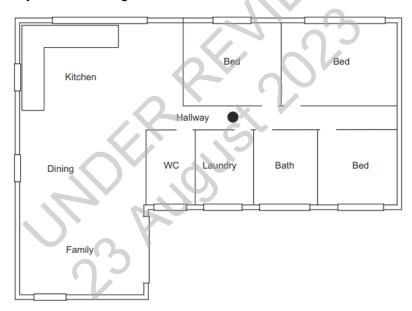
Class 1a building, location of smoke alarm where all bedrooms are grouped together and served by a hallway is illustrated by the black dot.
